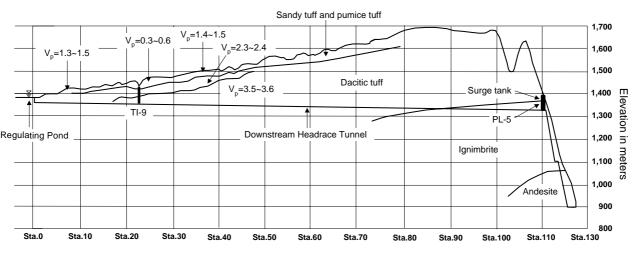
Geological Profile along Downstream Headrace Tunnel Obtained from Tender Design Stage
